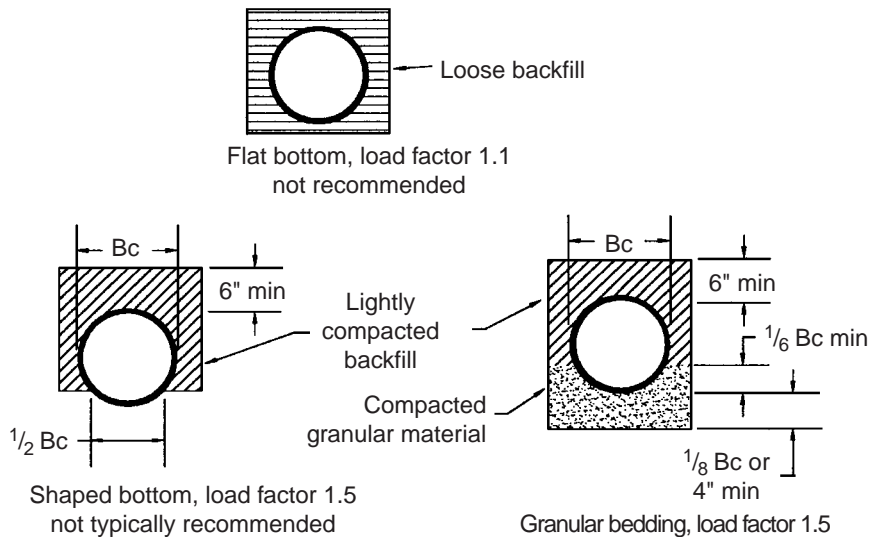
Class C pipe bedding detail. (American Society of Civil Engineers, *Design and Construction of Sanitary and Storm Sewers*, 1969. Used with permission of ASCE.)
